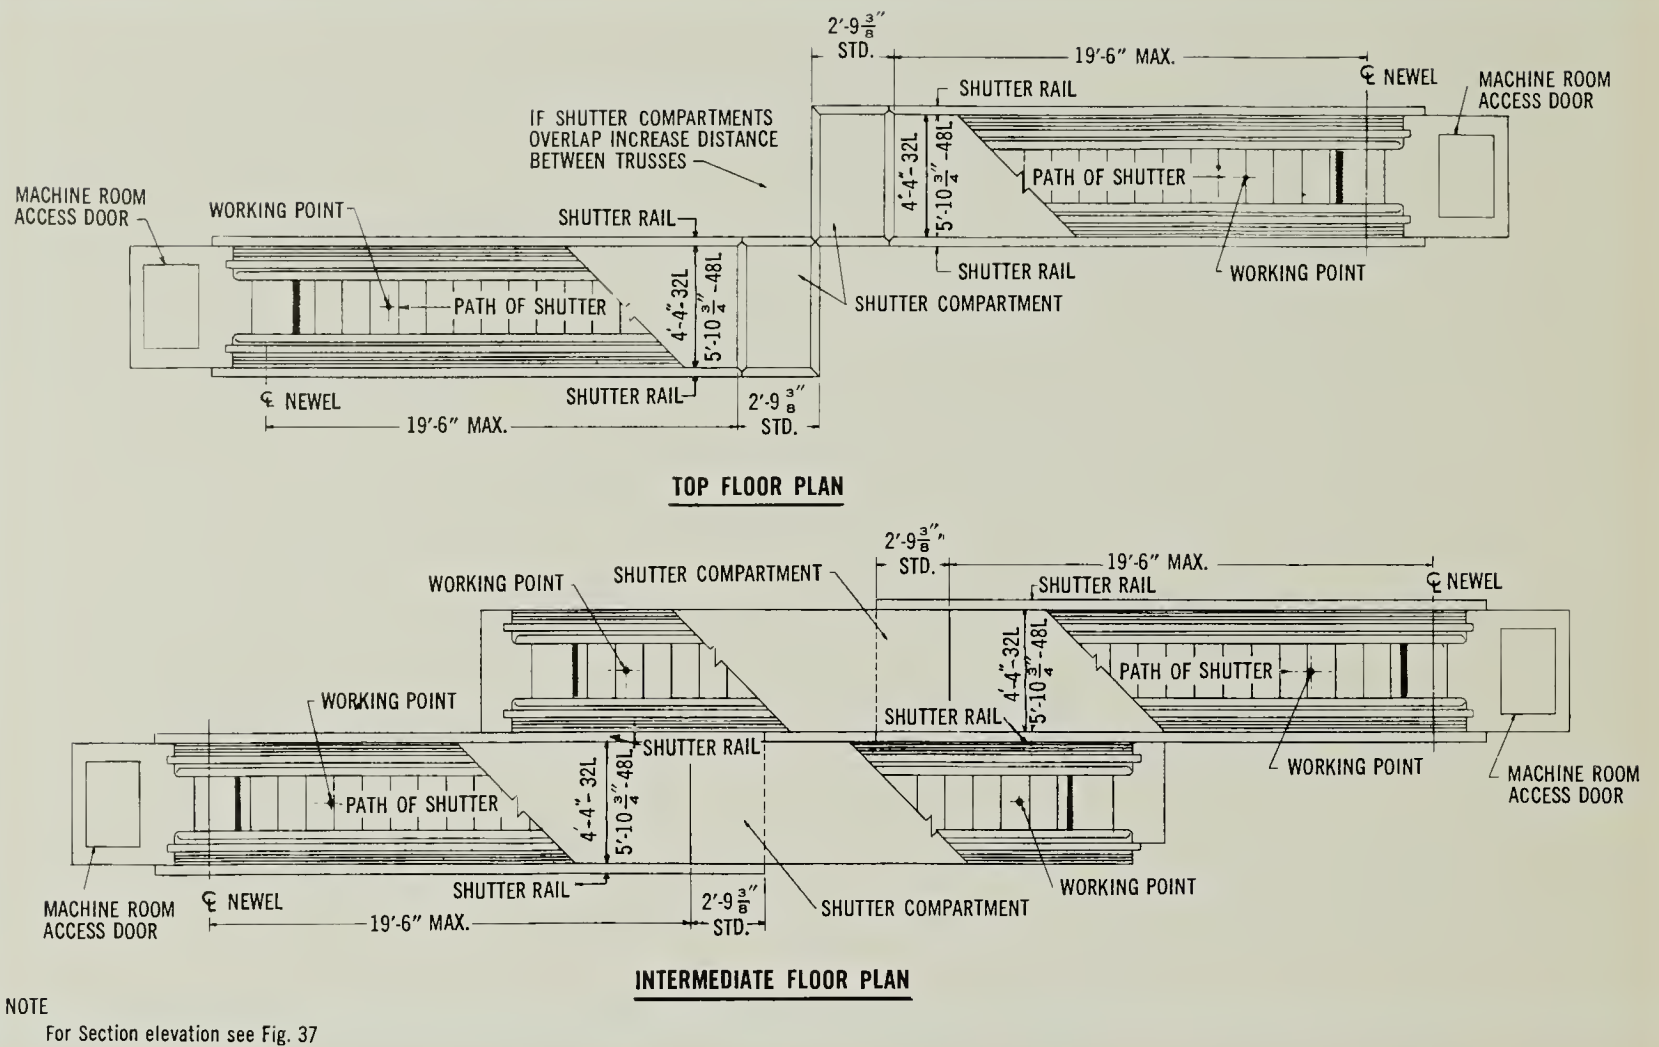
Criss-Cross Arrangement—Fire Shutter Plan
